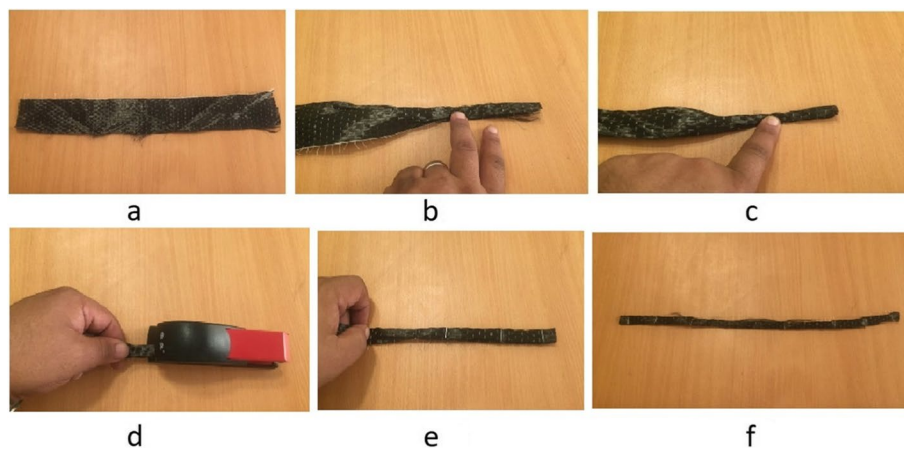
Manufacturing procedure of MMFRP sheets. a Cut FRP sheet to strips. b Fold strip over itself. c Fold strip again. d Install folded strips by pins. e Install by more pins. f Stirrup ready to use
